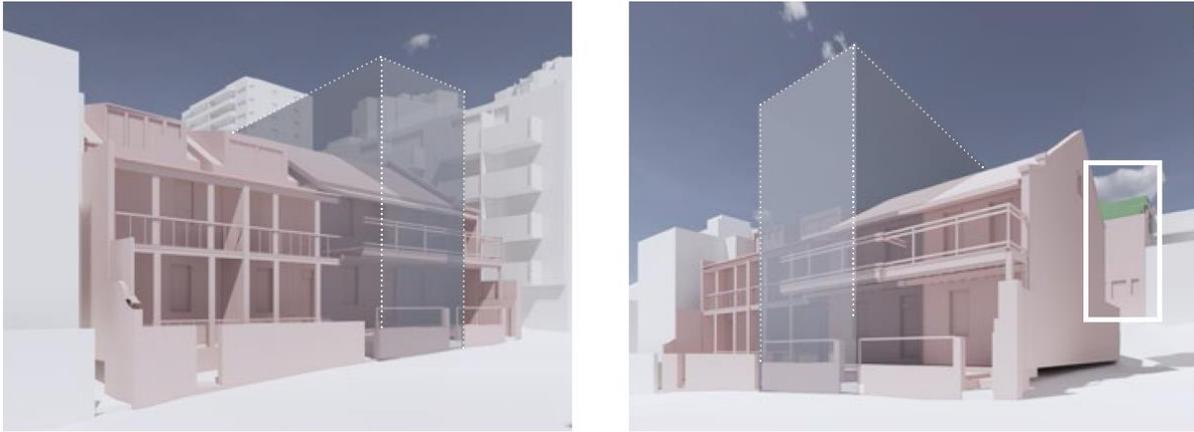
Indicative modelling of the conserved/restored buildings to Brougham Street
